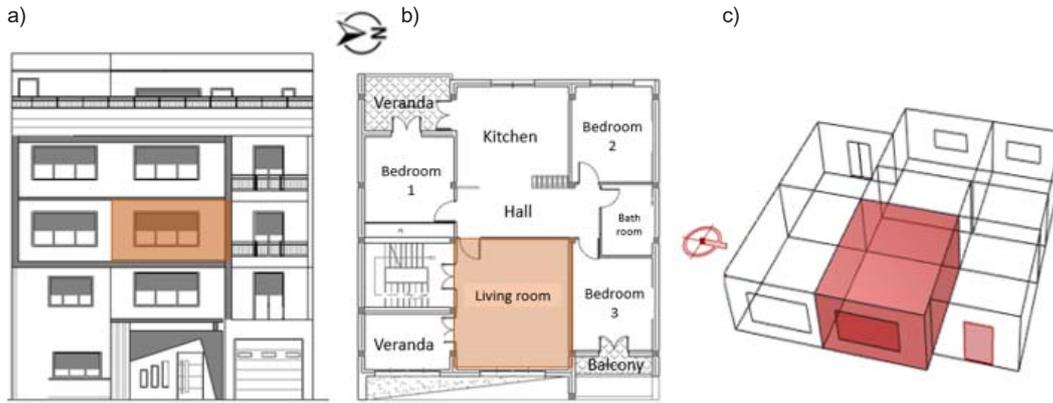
Case study room: (a) facade view, (b) floor plan (scale 1:50), and (c) 3D perspective
